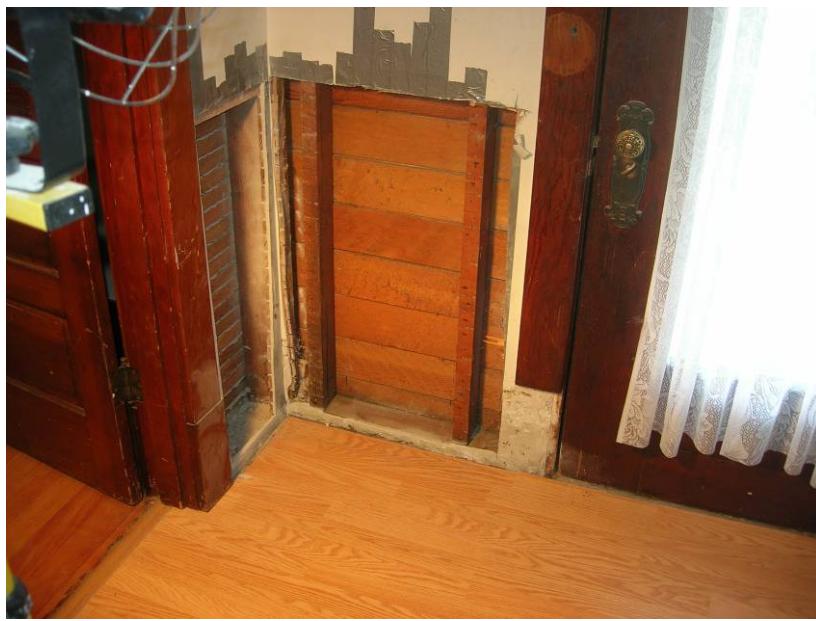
Smith House, Opening No. 2. Interior opening of east exterior wall adjacent to front door.
